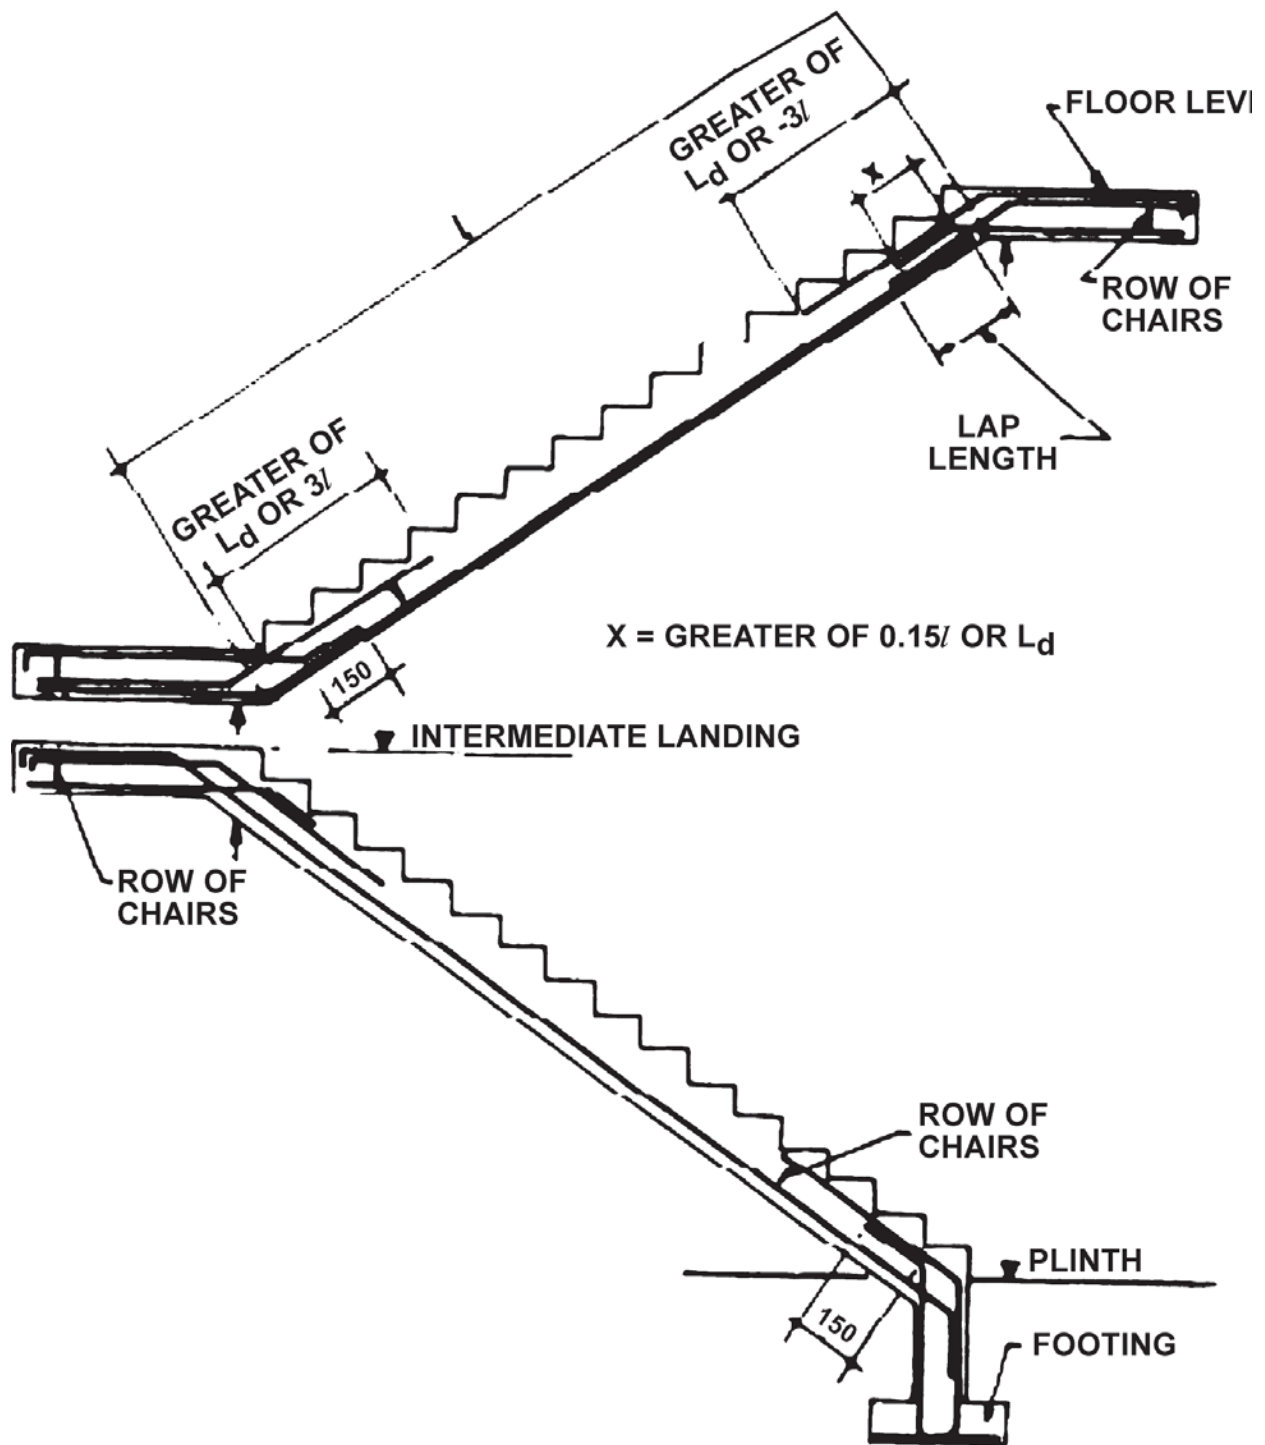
STAIRS SUPPORTED AT ENDS OF FLIGHTS - SHOWING MAIN REINFORCEMENT
